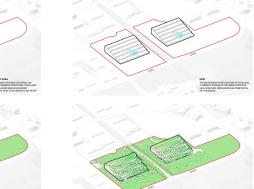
Proposed Design Concepts Google Caribbean Campus Kimley »Horn
